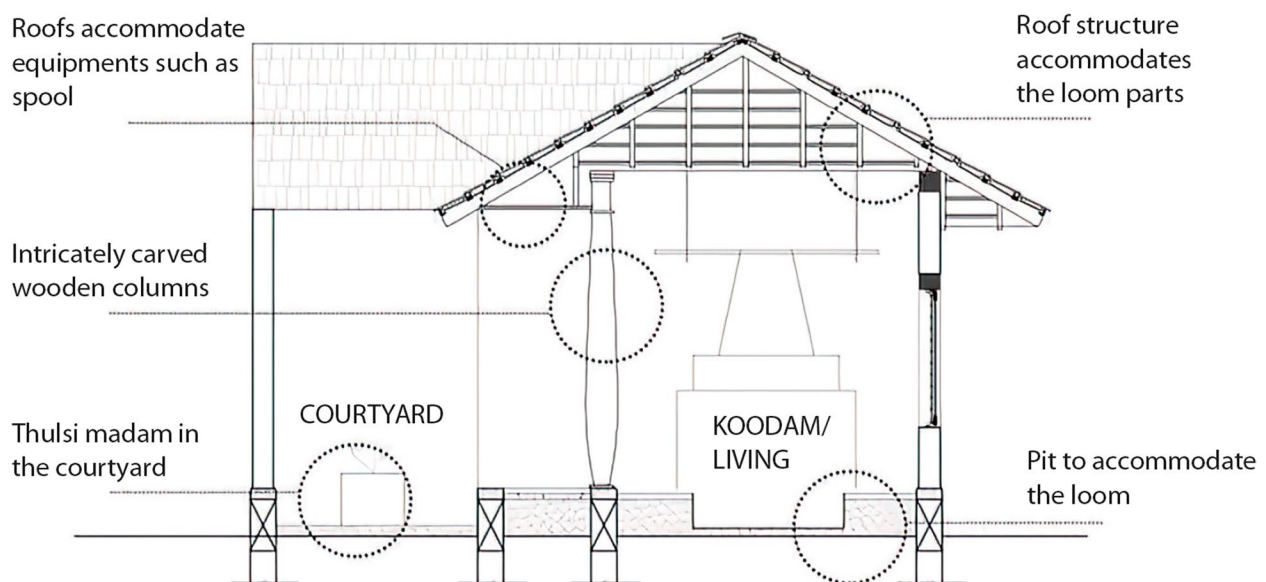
Section showing the workspace and adjoining courtyard (Source: the author)
